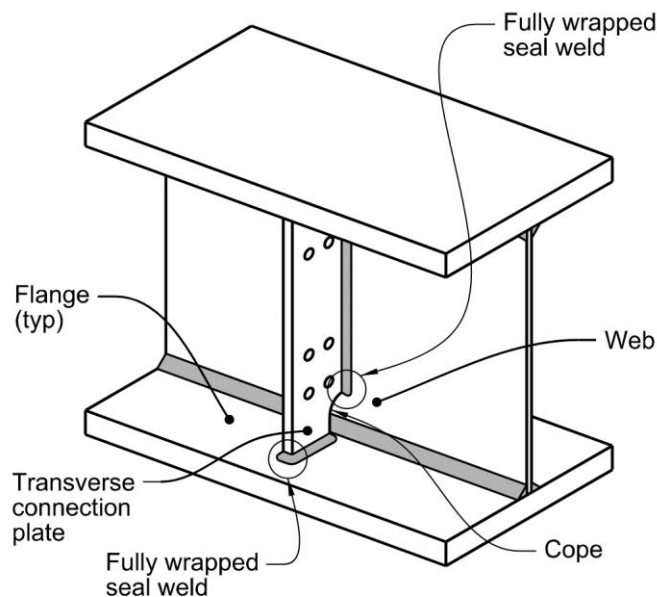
Intersection of a coped, seal-welded transverse connection plate with a girder web and a girder flange.
